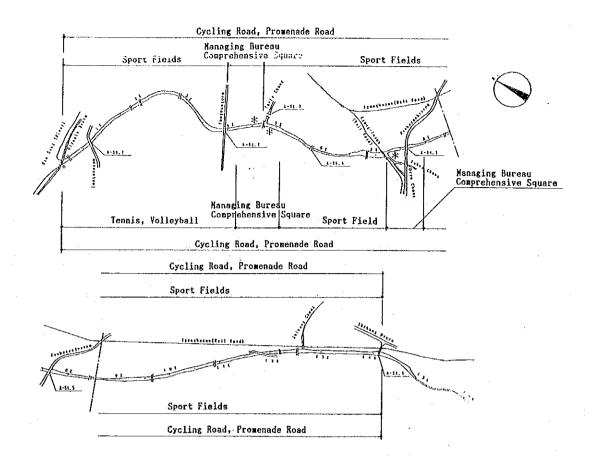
E Proposed Facility Plan of Anyang Chong
